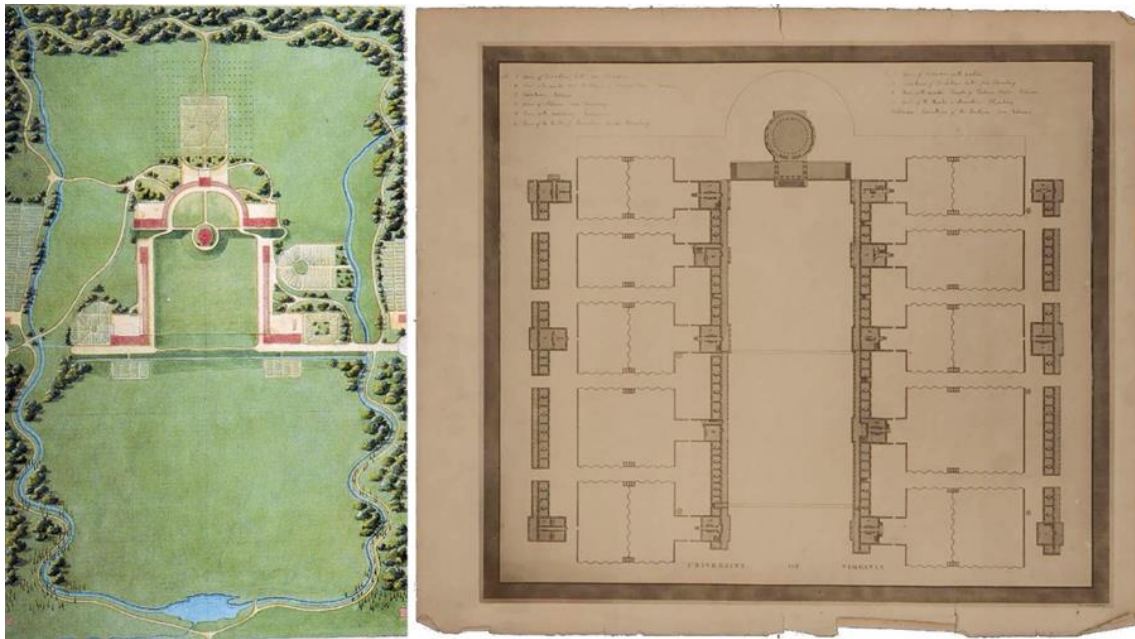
Joseph-Jacques Ramée's 1813 masterplan for Union College in Schenectady, New York (left) (Source: Wikipedia/Hedinger & Berger, 2003) (NOTE: Top of the drawing is southeast, true north is toward the left corner of the drawing) and the Maverick Plan of the University of Virginia, 1923 facsimile of 1822 engraving of the ground plot based on Thomas Jefferson's 1817 masterplan (right) (Source: Thomas Jefferson, architect; original designs in the collection of Thomas Jefferson Coolidge, Junior. E332.J48 1916, Special Collections, University of Virginia, Charlottesville, Virginia, USA) (NOTE: Drawing is oriented ~20 degrees off true north, which is towards the top right corner of the drawing).
